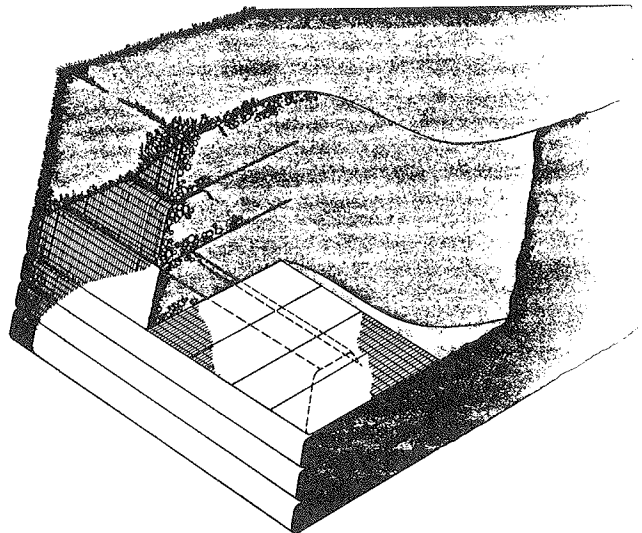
Facings formed by wrap-around reinforcement. [Netlon Ltd., 1984b]
